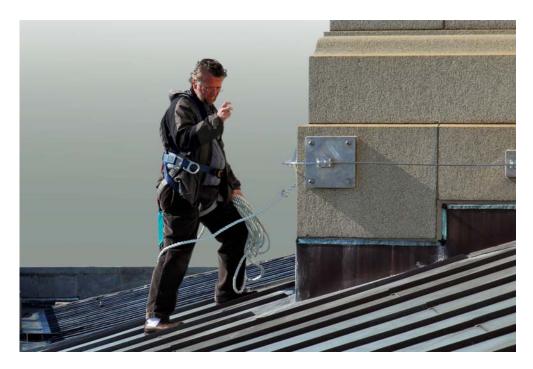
This photograph illustrates how HLL systems can be effective at providing continuous fall protection around corners.
